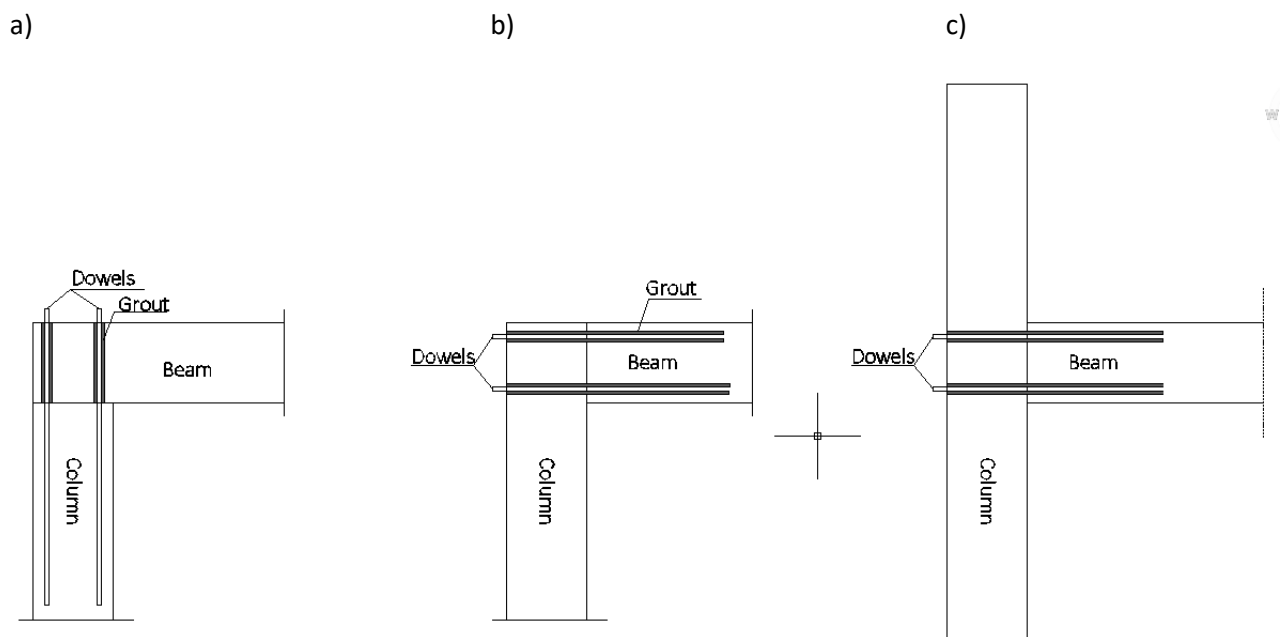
Possible use of connection performed with a) vertical dowels and horizontal dowels in b) single story structure and c) multi-story structures.
